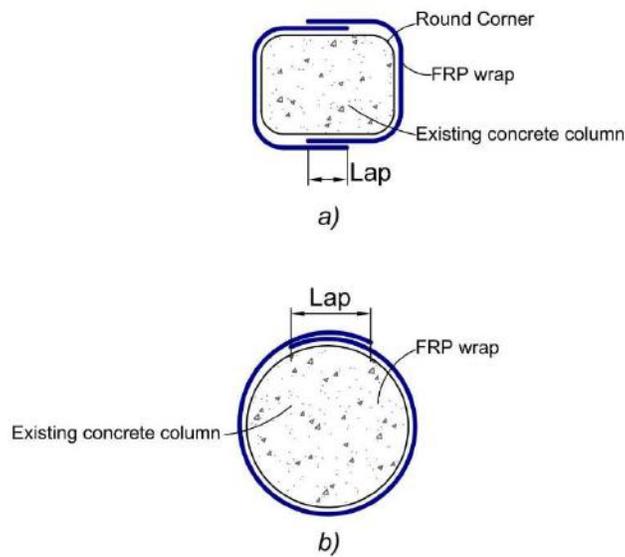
Seismic retrofit of RC columns using FRP overlays: a) rectangular section and b) circular section (FEMA 547, 2006).
